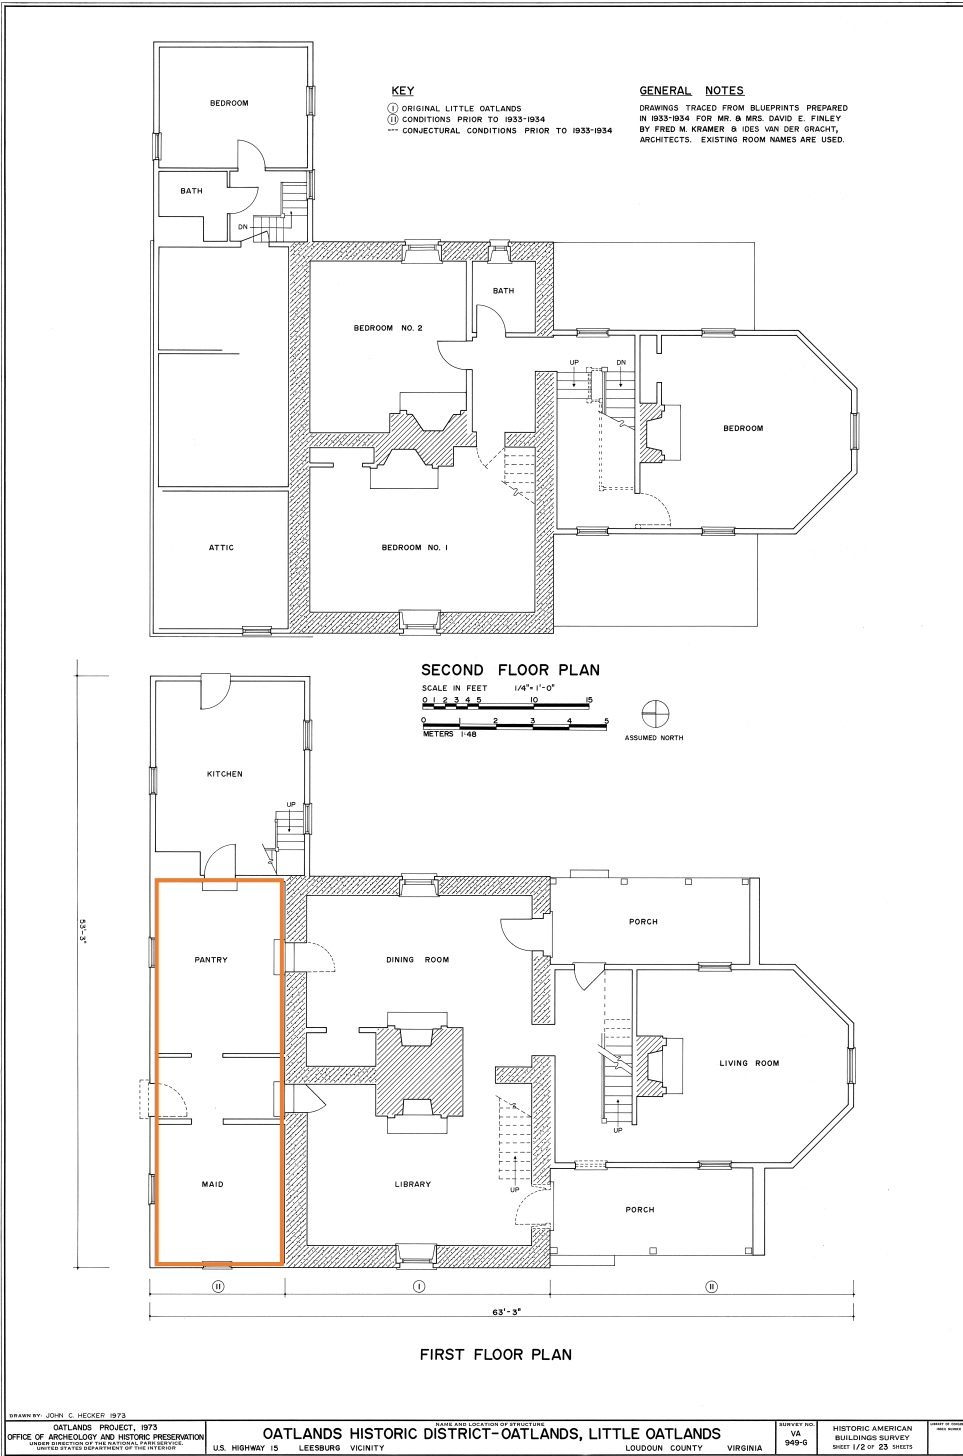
Little Oatlands Duplex 1, floor plans as drawn by HABS (1973); the first addition along the north elevation of the stone building is indicated in orange.
